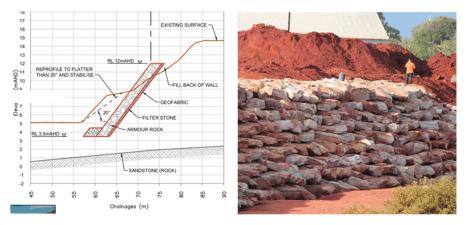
Typical section of Option 2 (left) and example high crested revetment (right).
